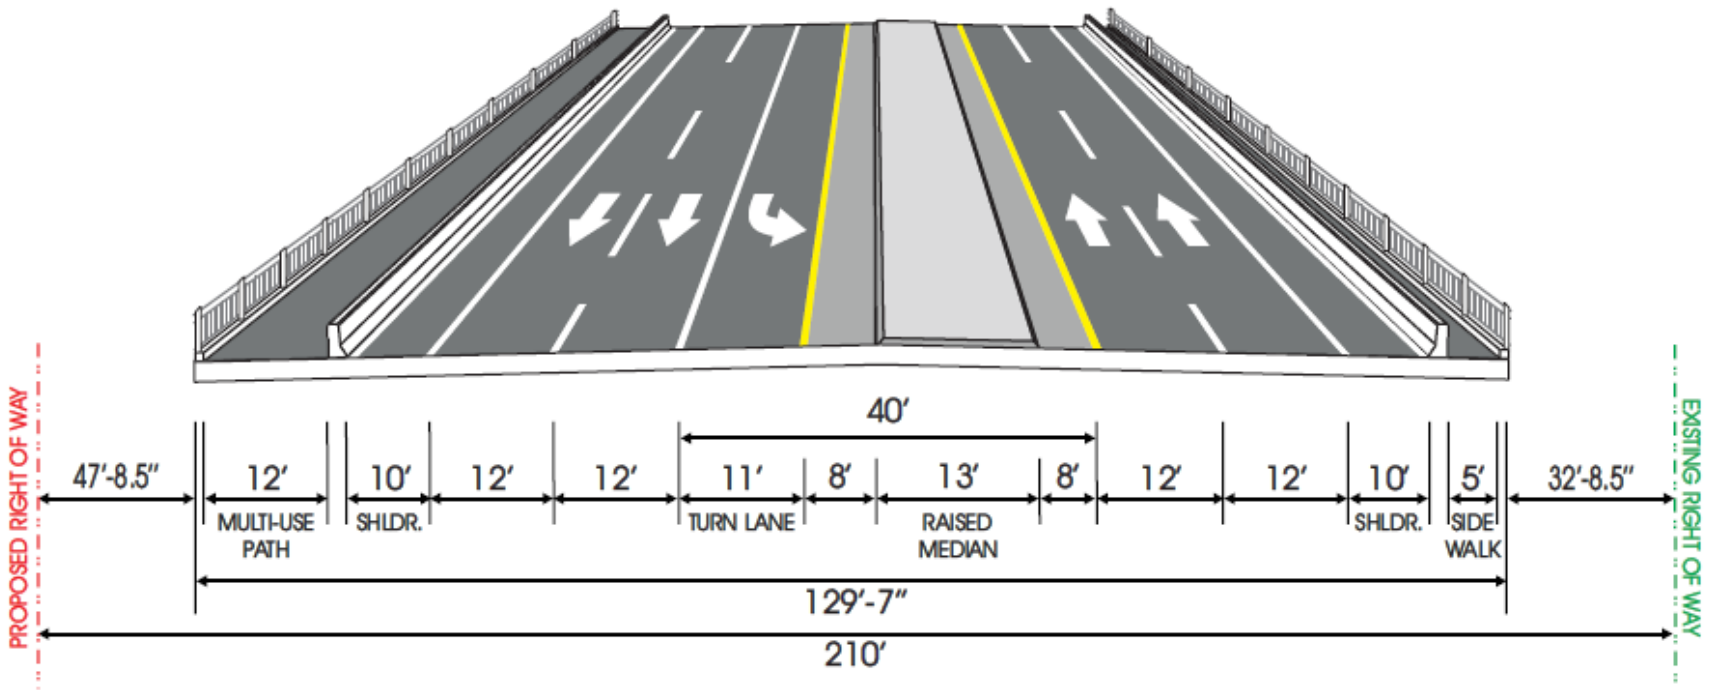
Approved PD&E Bridge Typical Section – SR 710 Crossing at Taylor Creek
